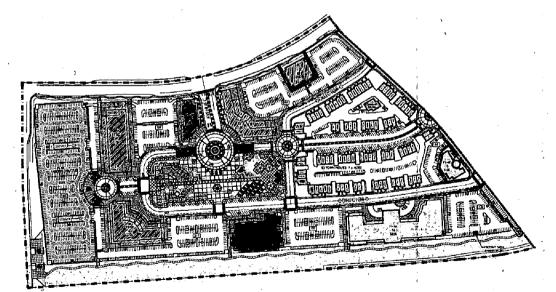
B: NEIGHBORHOOD 2 "PARK PLACE" SCHEMATIC PLAN
